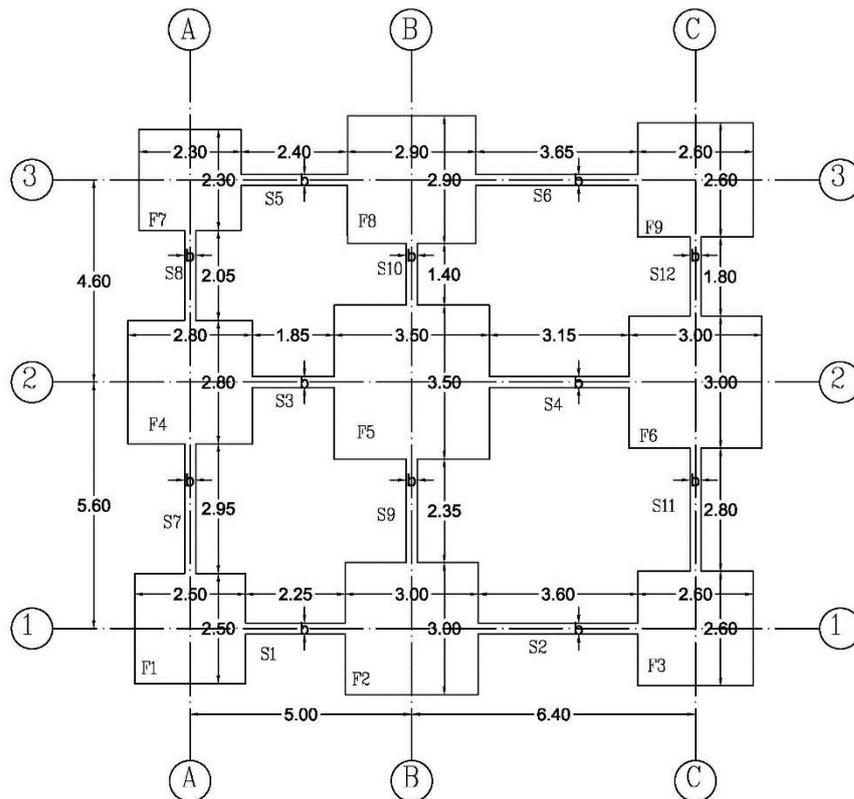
Plan of footings and ground tie-beams dimensions with fixed depth 60 cm.
